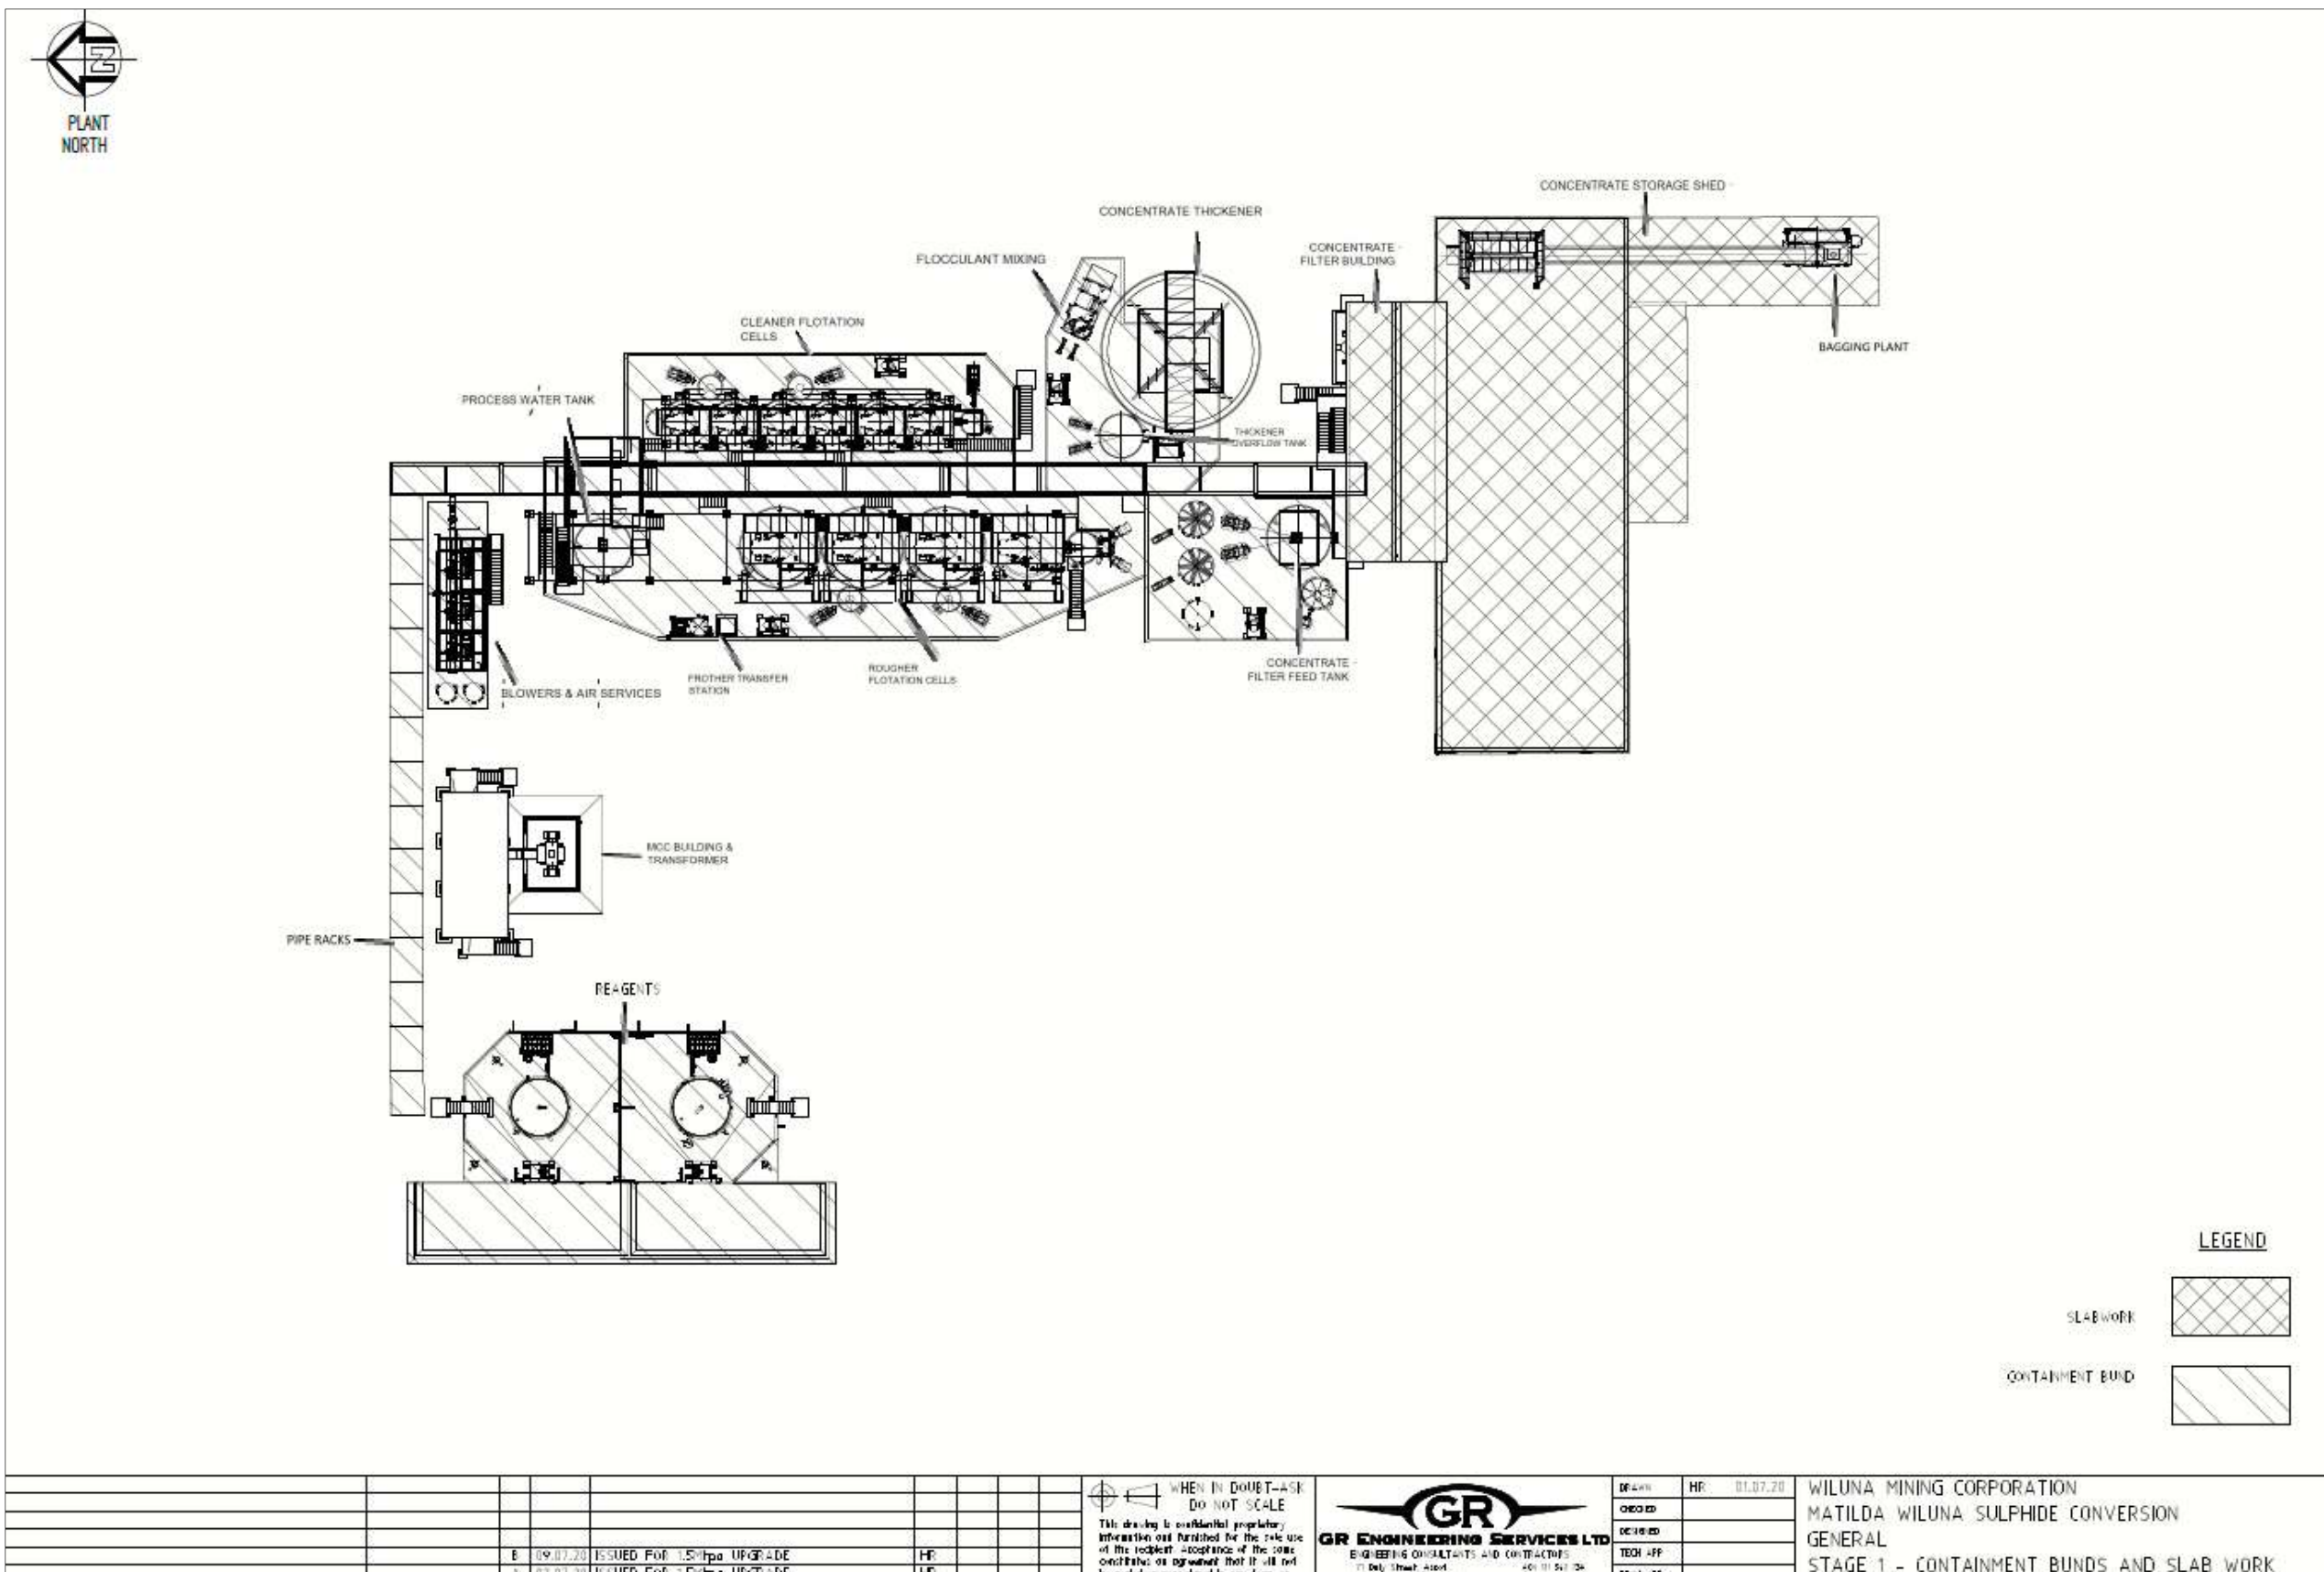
General Arrangement Layout of Sulphate Ore Processing including concrete bundled areas in the Sulphide Processing Plant
